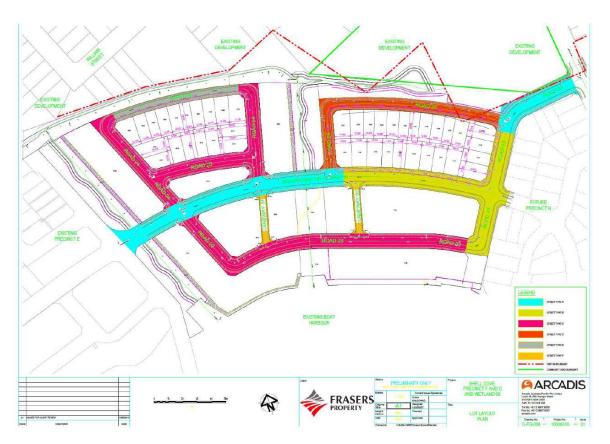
Precinct F & G Road Hierarchy and Lot Layout
